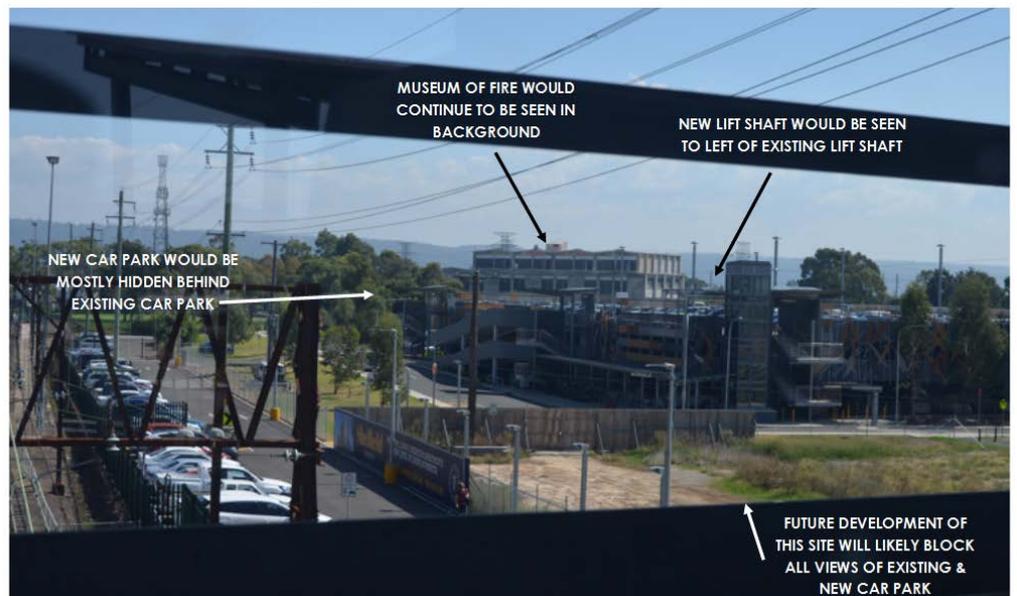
EXISTING VIEW FROM PENRITH STATION CONCOURSE, LOOKING NORTH-WEST
